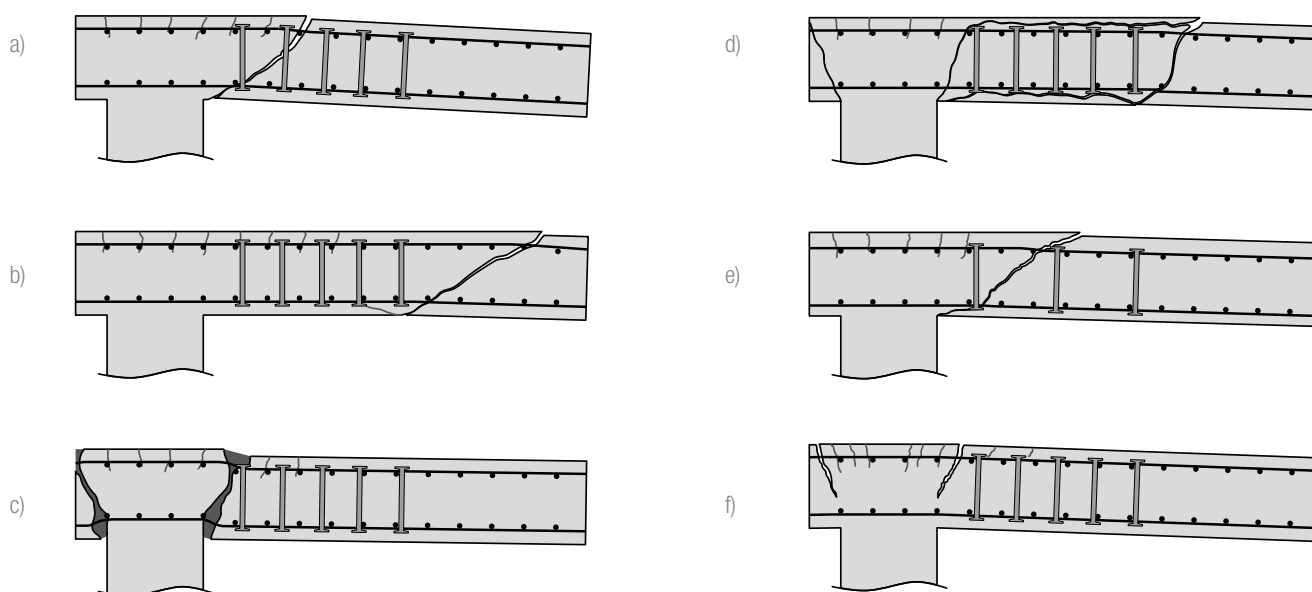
Failure modes of slabs reinforced with punching reinforcement [6]
